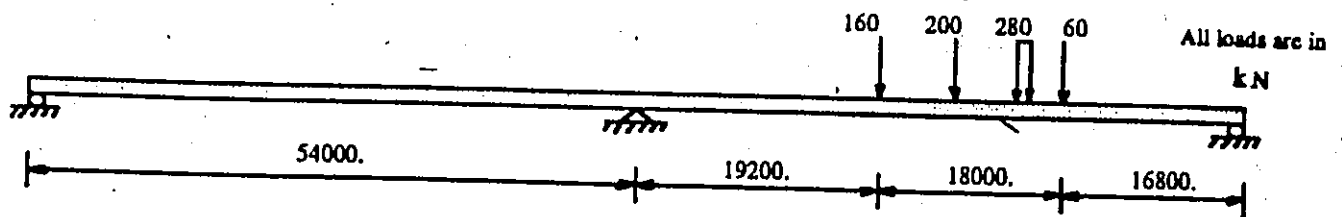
Load Position in the S.S. Box Girder Bridge
